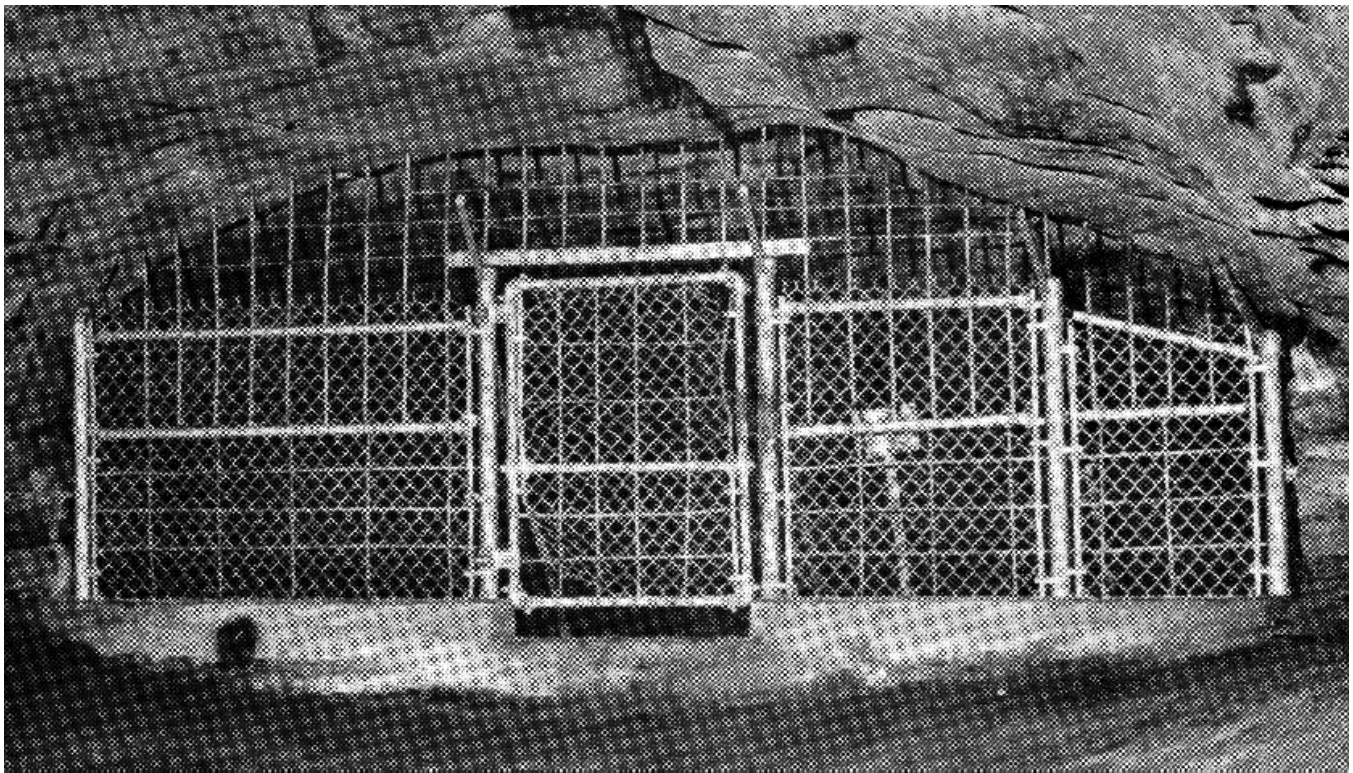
Georgetown Cave gate. Vertical bars are too narrowly spaced, and fence covering further restricts bat movement. Concrete foundation projecting above floor level alters air flow.
